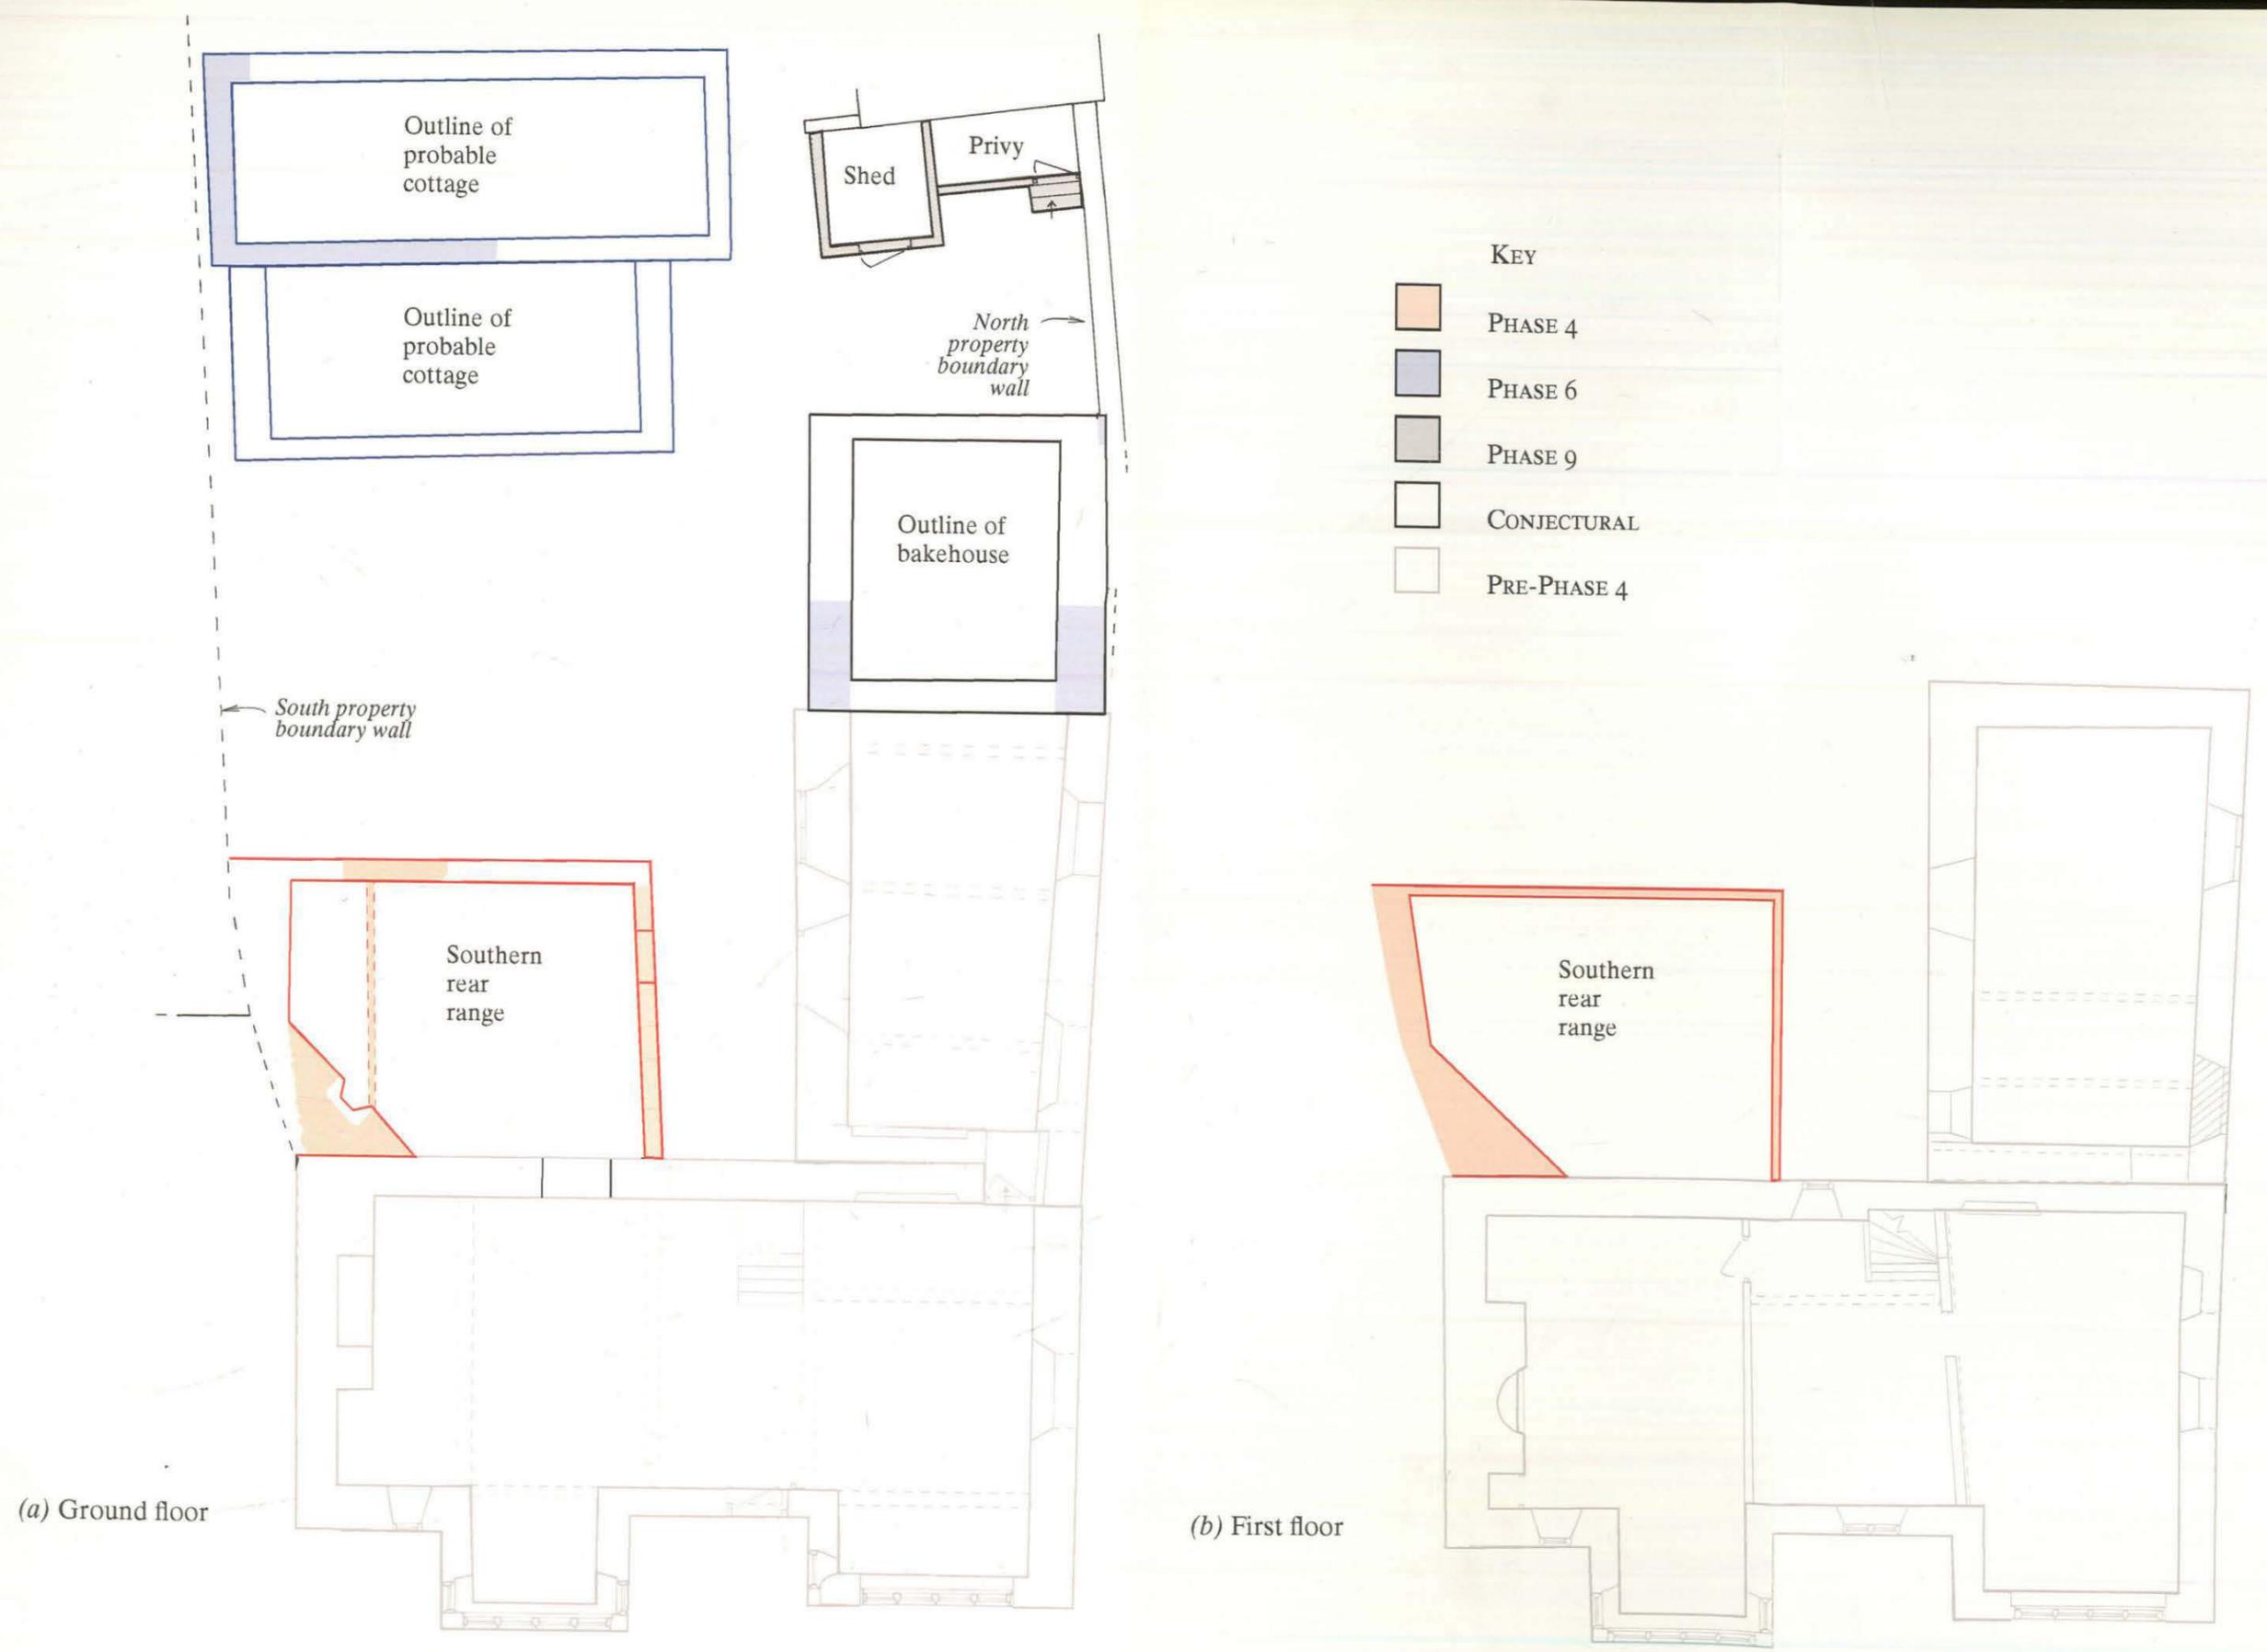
Phases 4, 6 and 9 — Conjectural reconstruction plans. (a) Ground floor and (b) First floor plans (1:100 scale).
